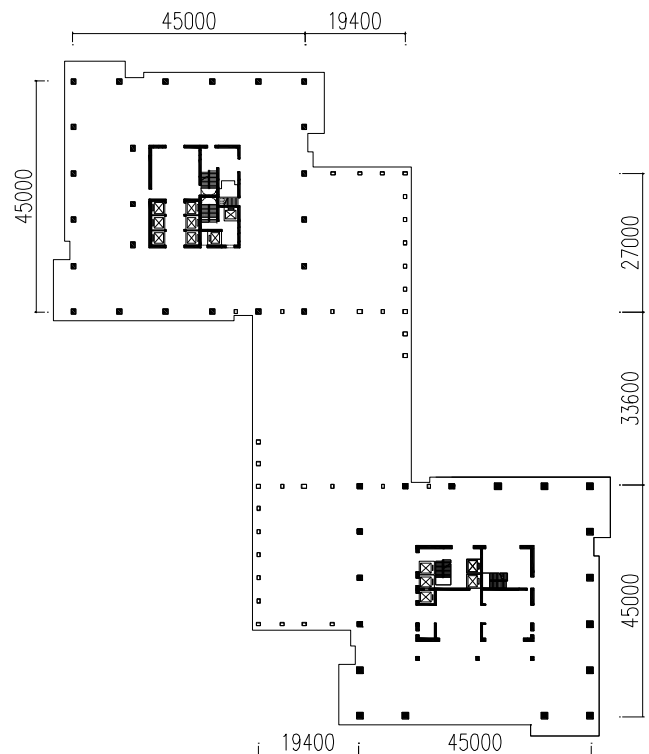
Linkbridge floor plane of Shenzhen Gemdale Viseen Tower.
